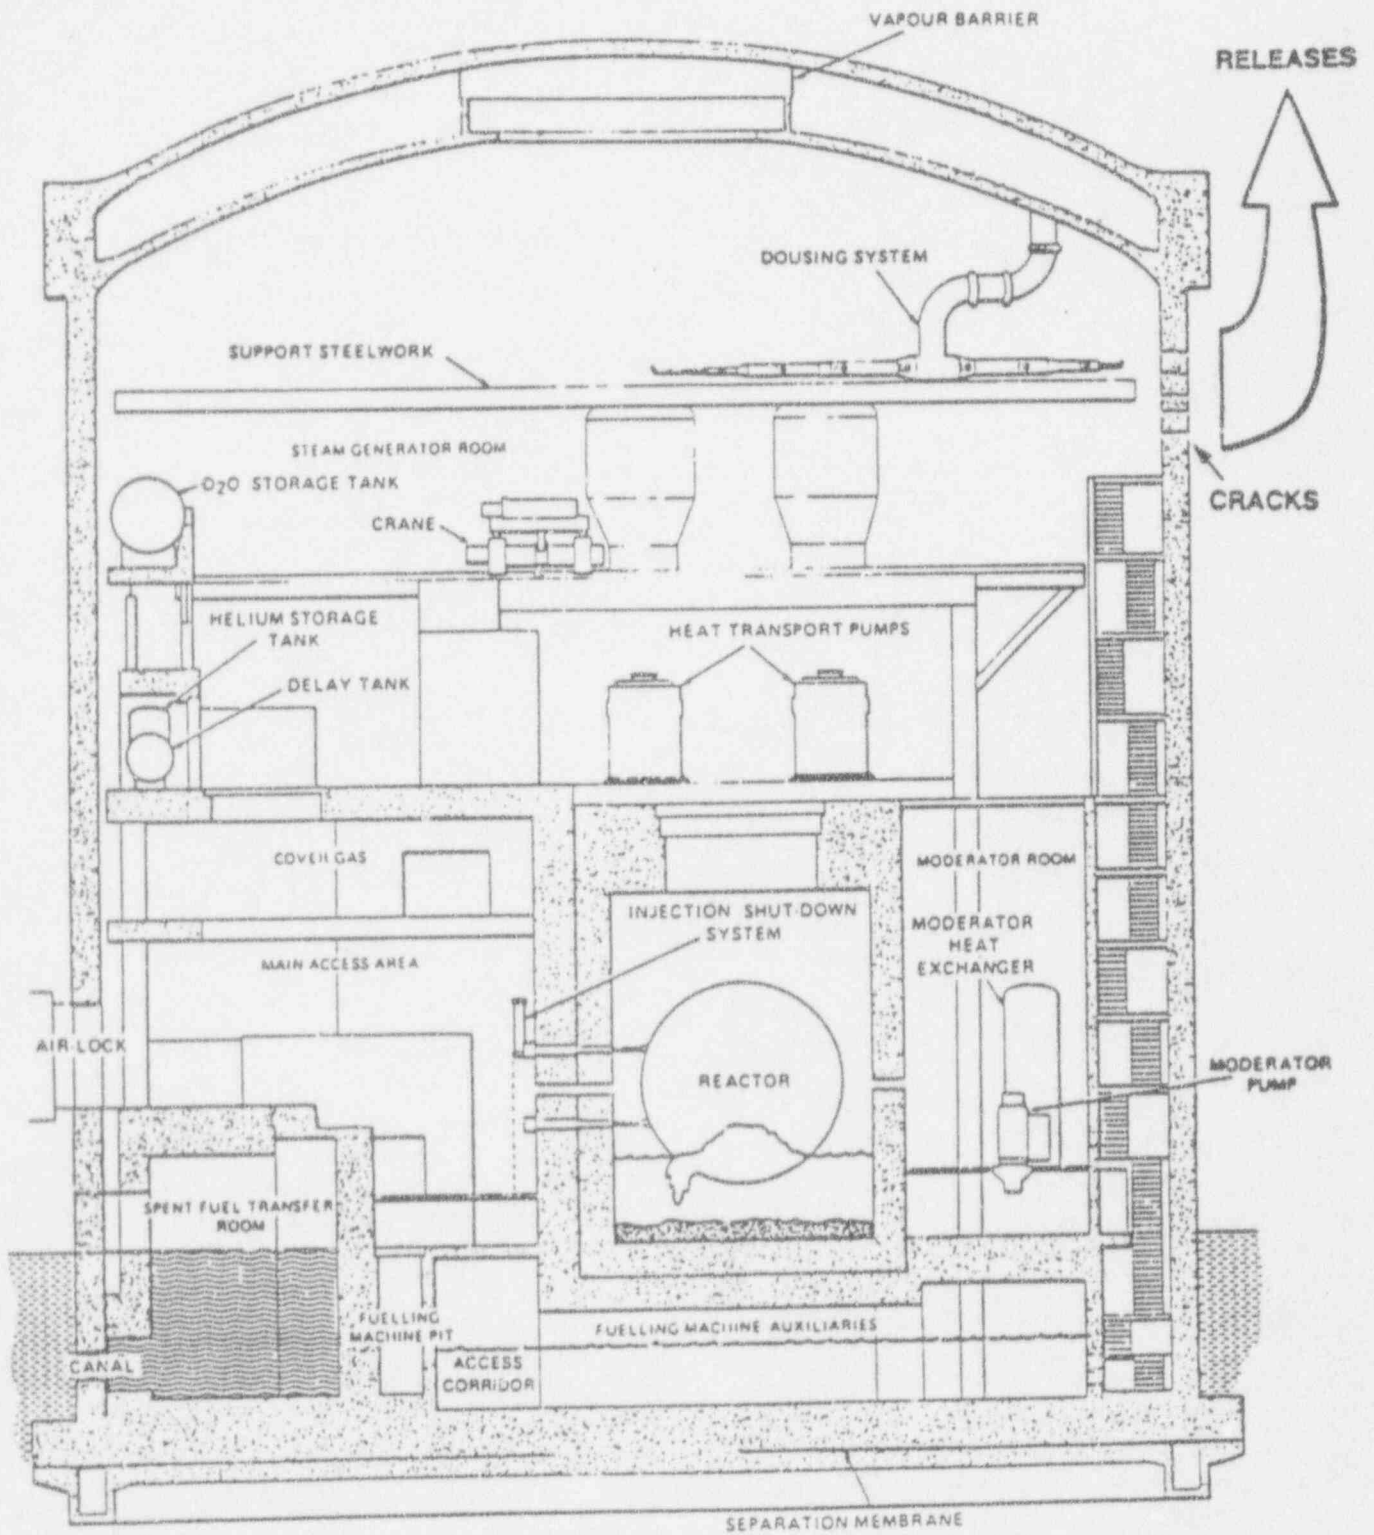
LATE CORE DISASSEMBLY - REACTOR BUILDING - 25 HOURS
